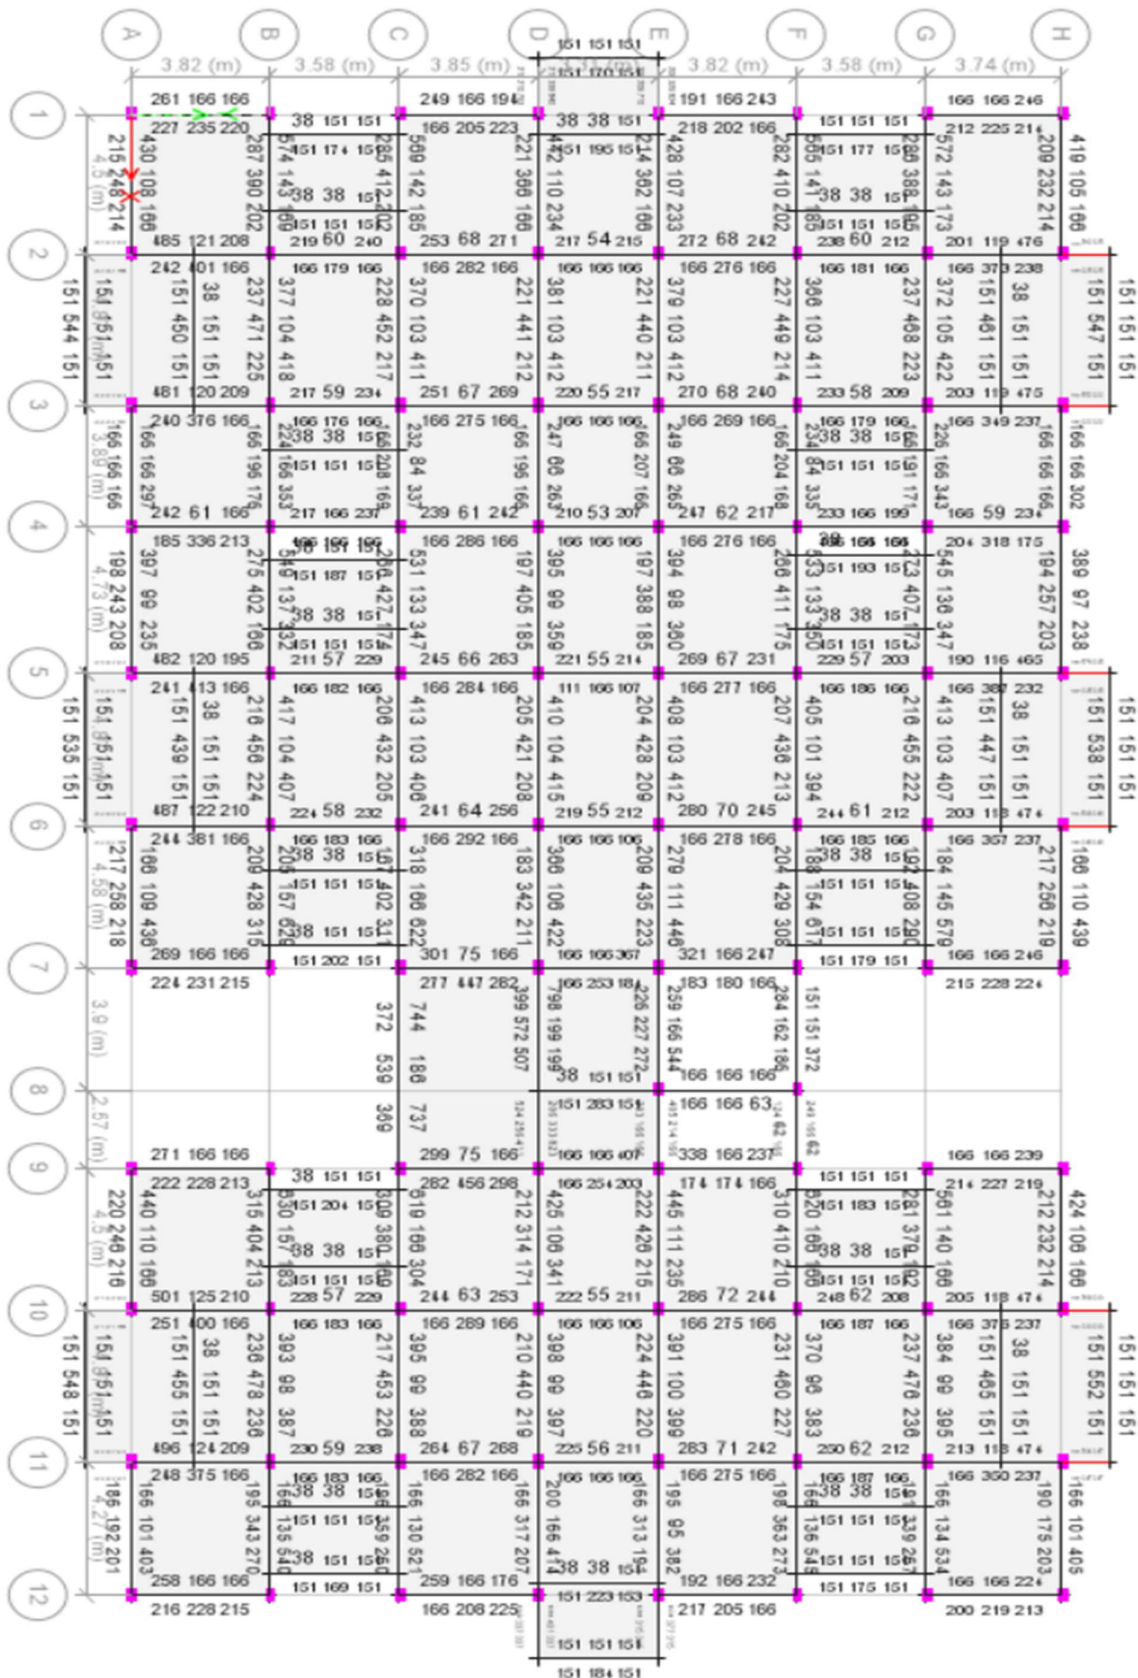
Area of Steel Required in Floor Beams (For Story 9)
